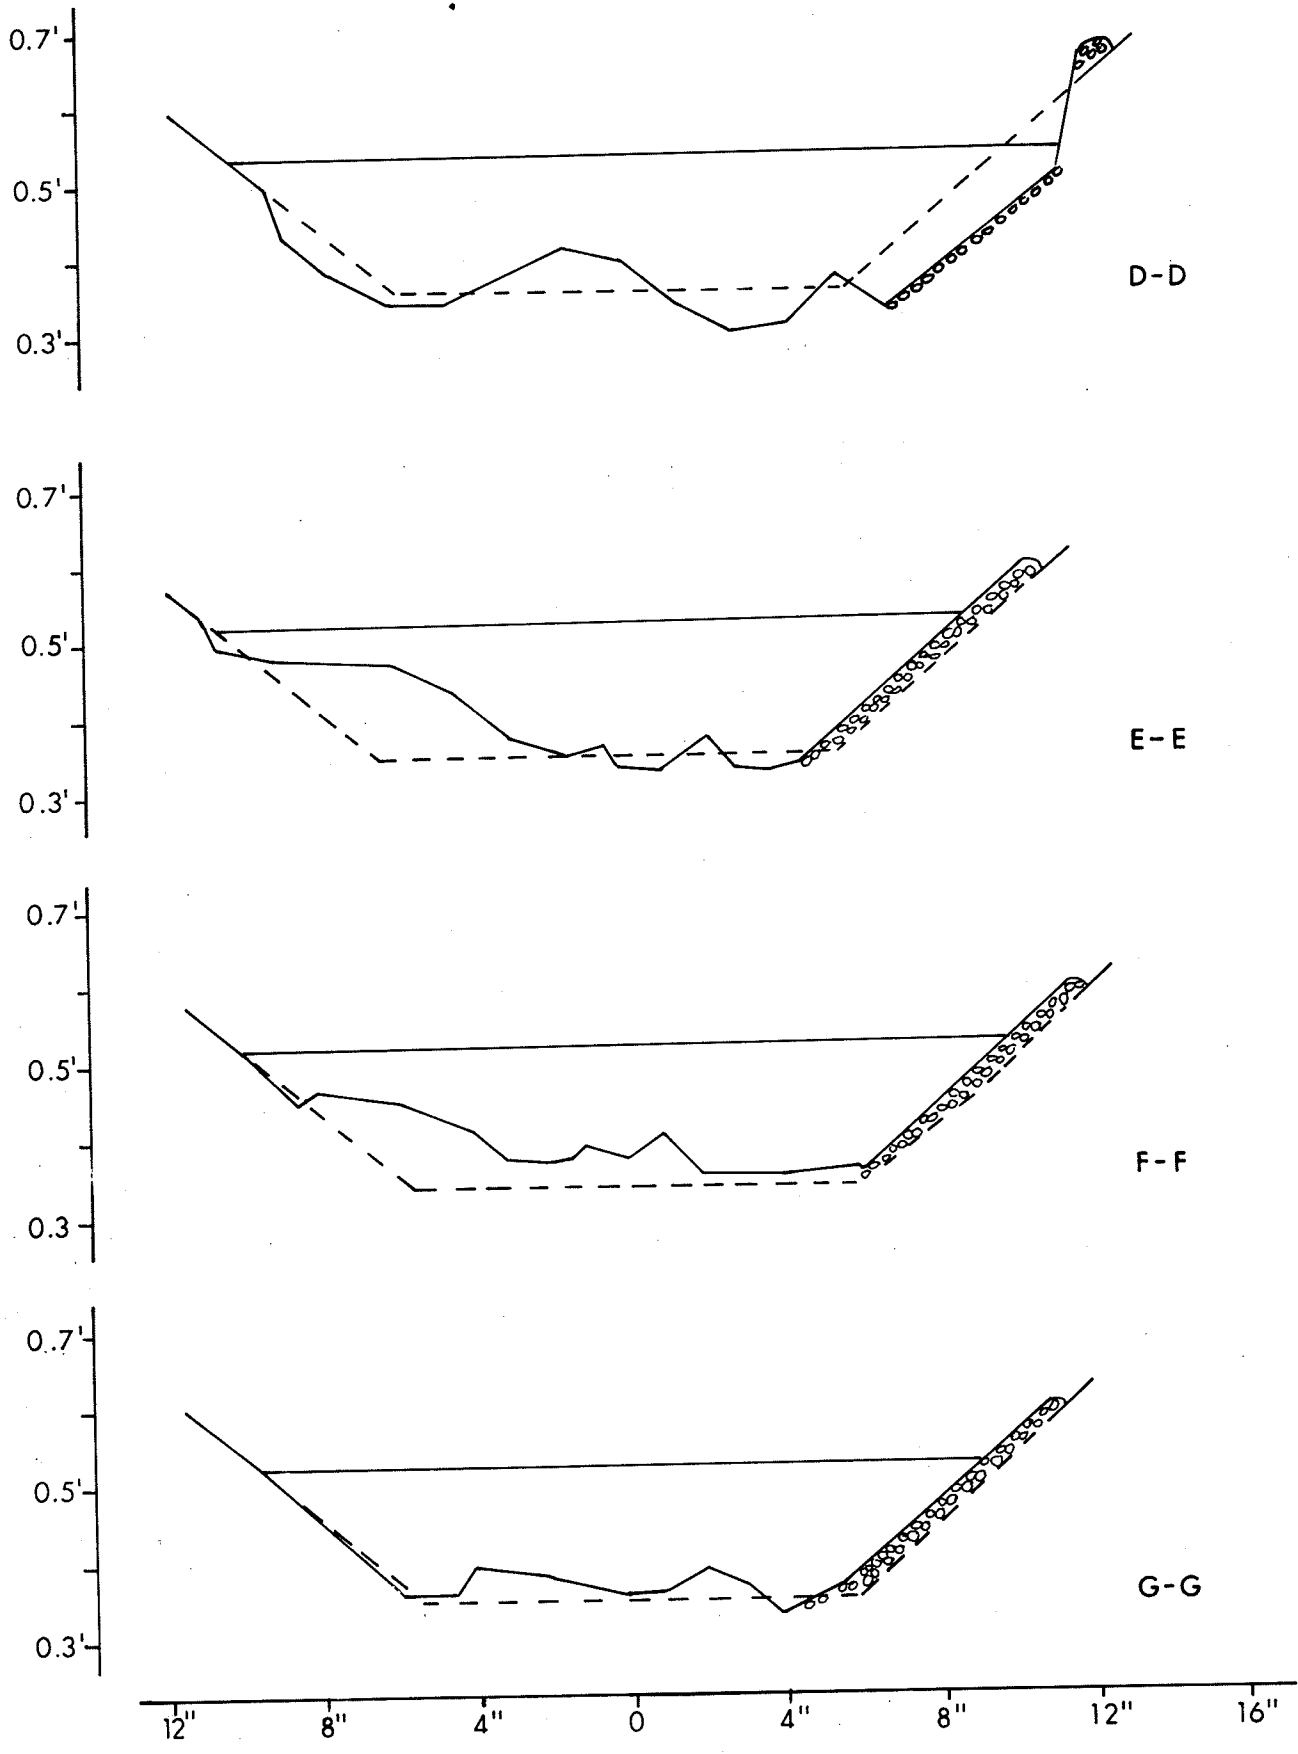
CROSS-SECTIONS FOR TEST No.9.
